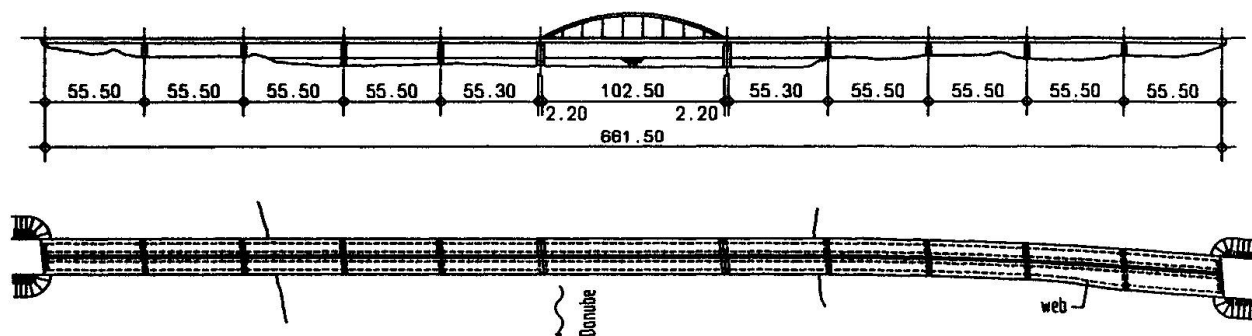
Elevation and plan view of structure of Danube Bridge Fischerdorf
